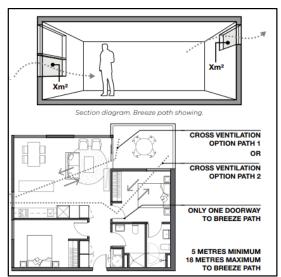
Examples of apartment design with consideration to cross ventilation (Image source: Apartment Design Guidelines for Victoria)
